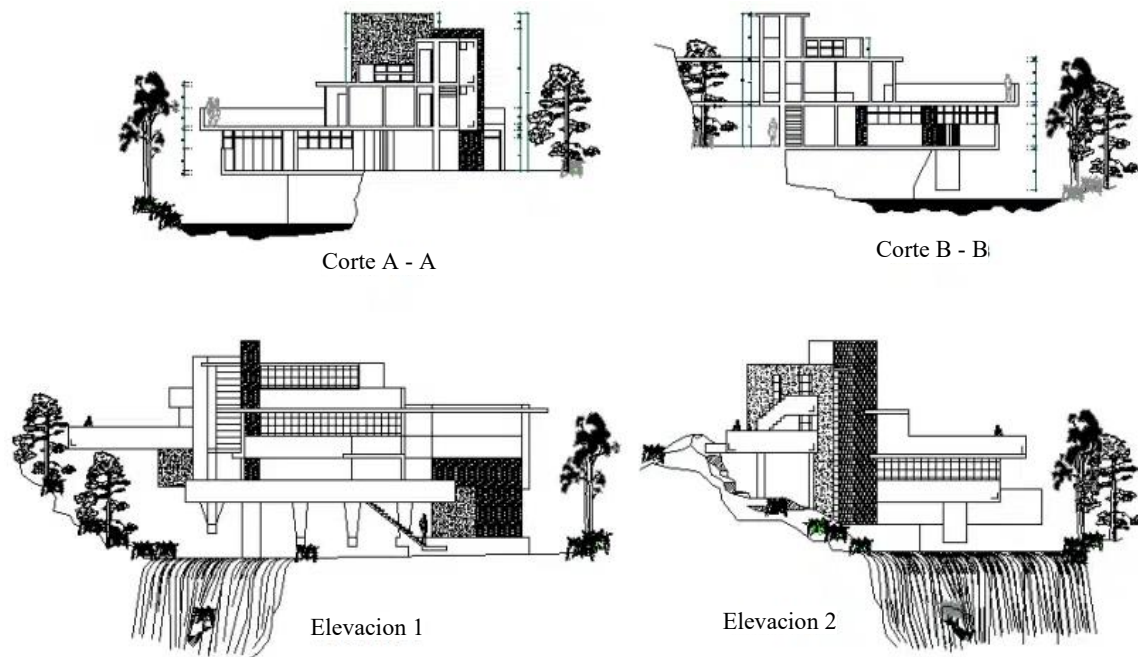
Elevations (*Section and Elevation Falling Water Frank Lloyd Wright Plan, n.d.*)
